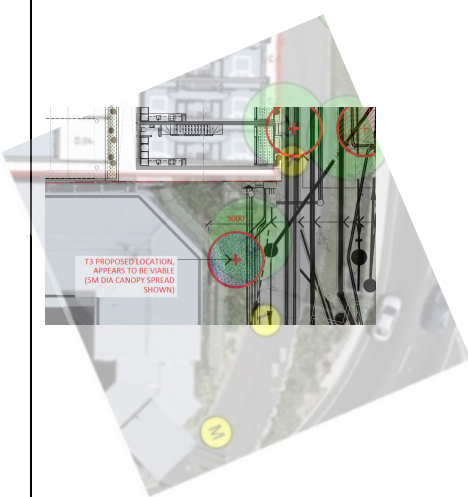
PLAN OF WIND TUNNEL TREES MADE TRANSPARENT TO OVERLAY ON WRAIGHT ASSOCIATES' PLANTING PLAN
